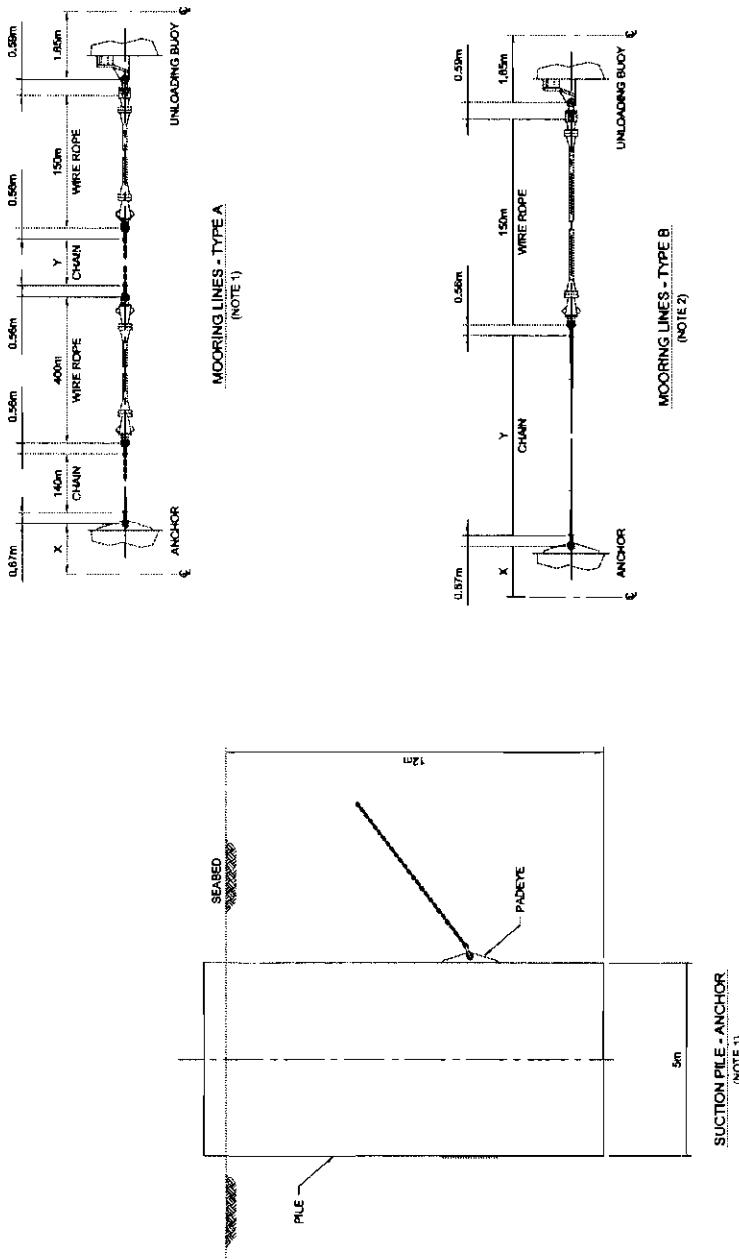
Unloading Buoy Mooring and Riser Arrangement
